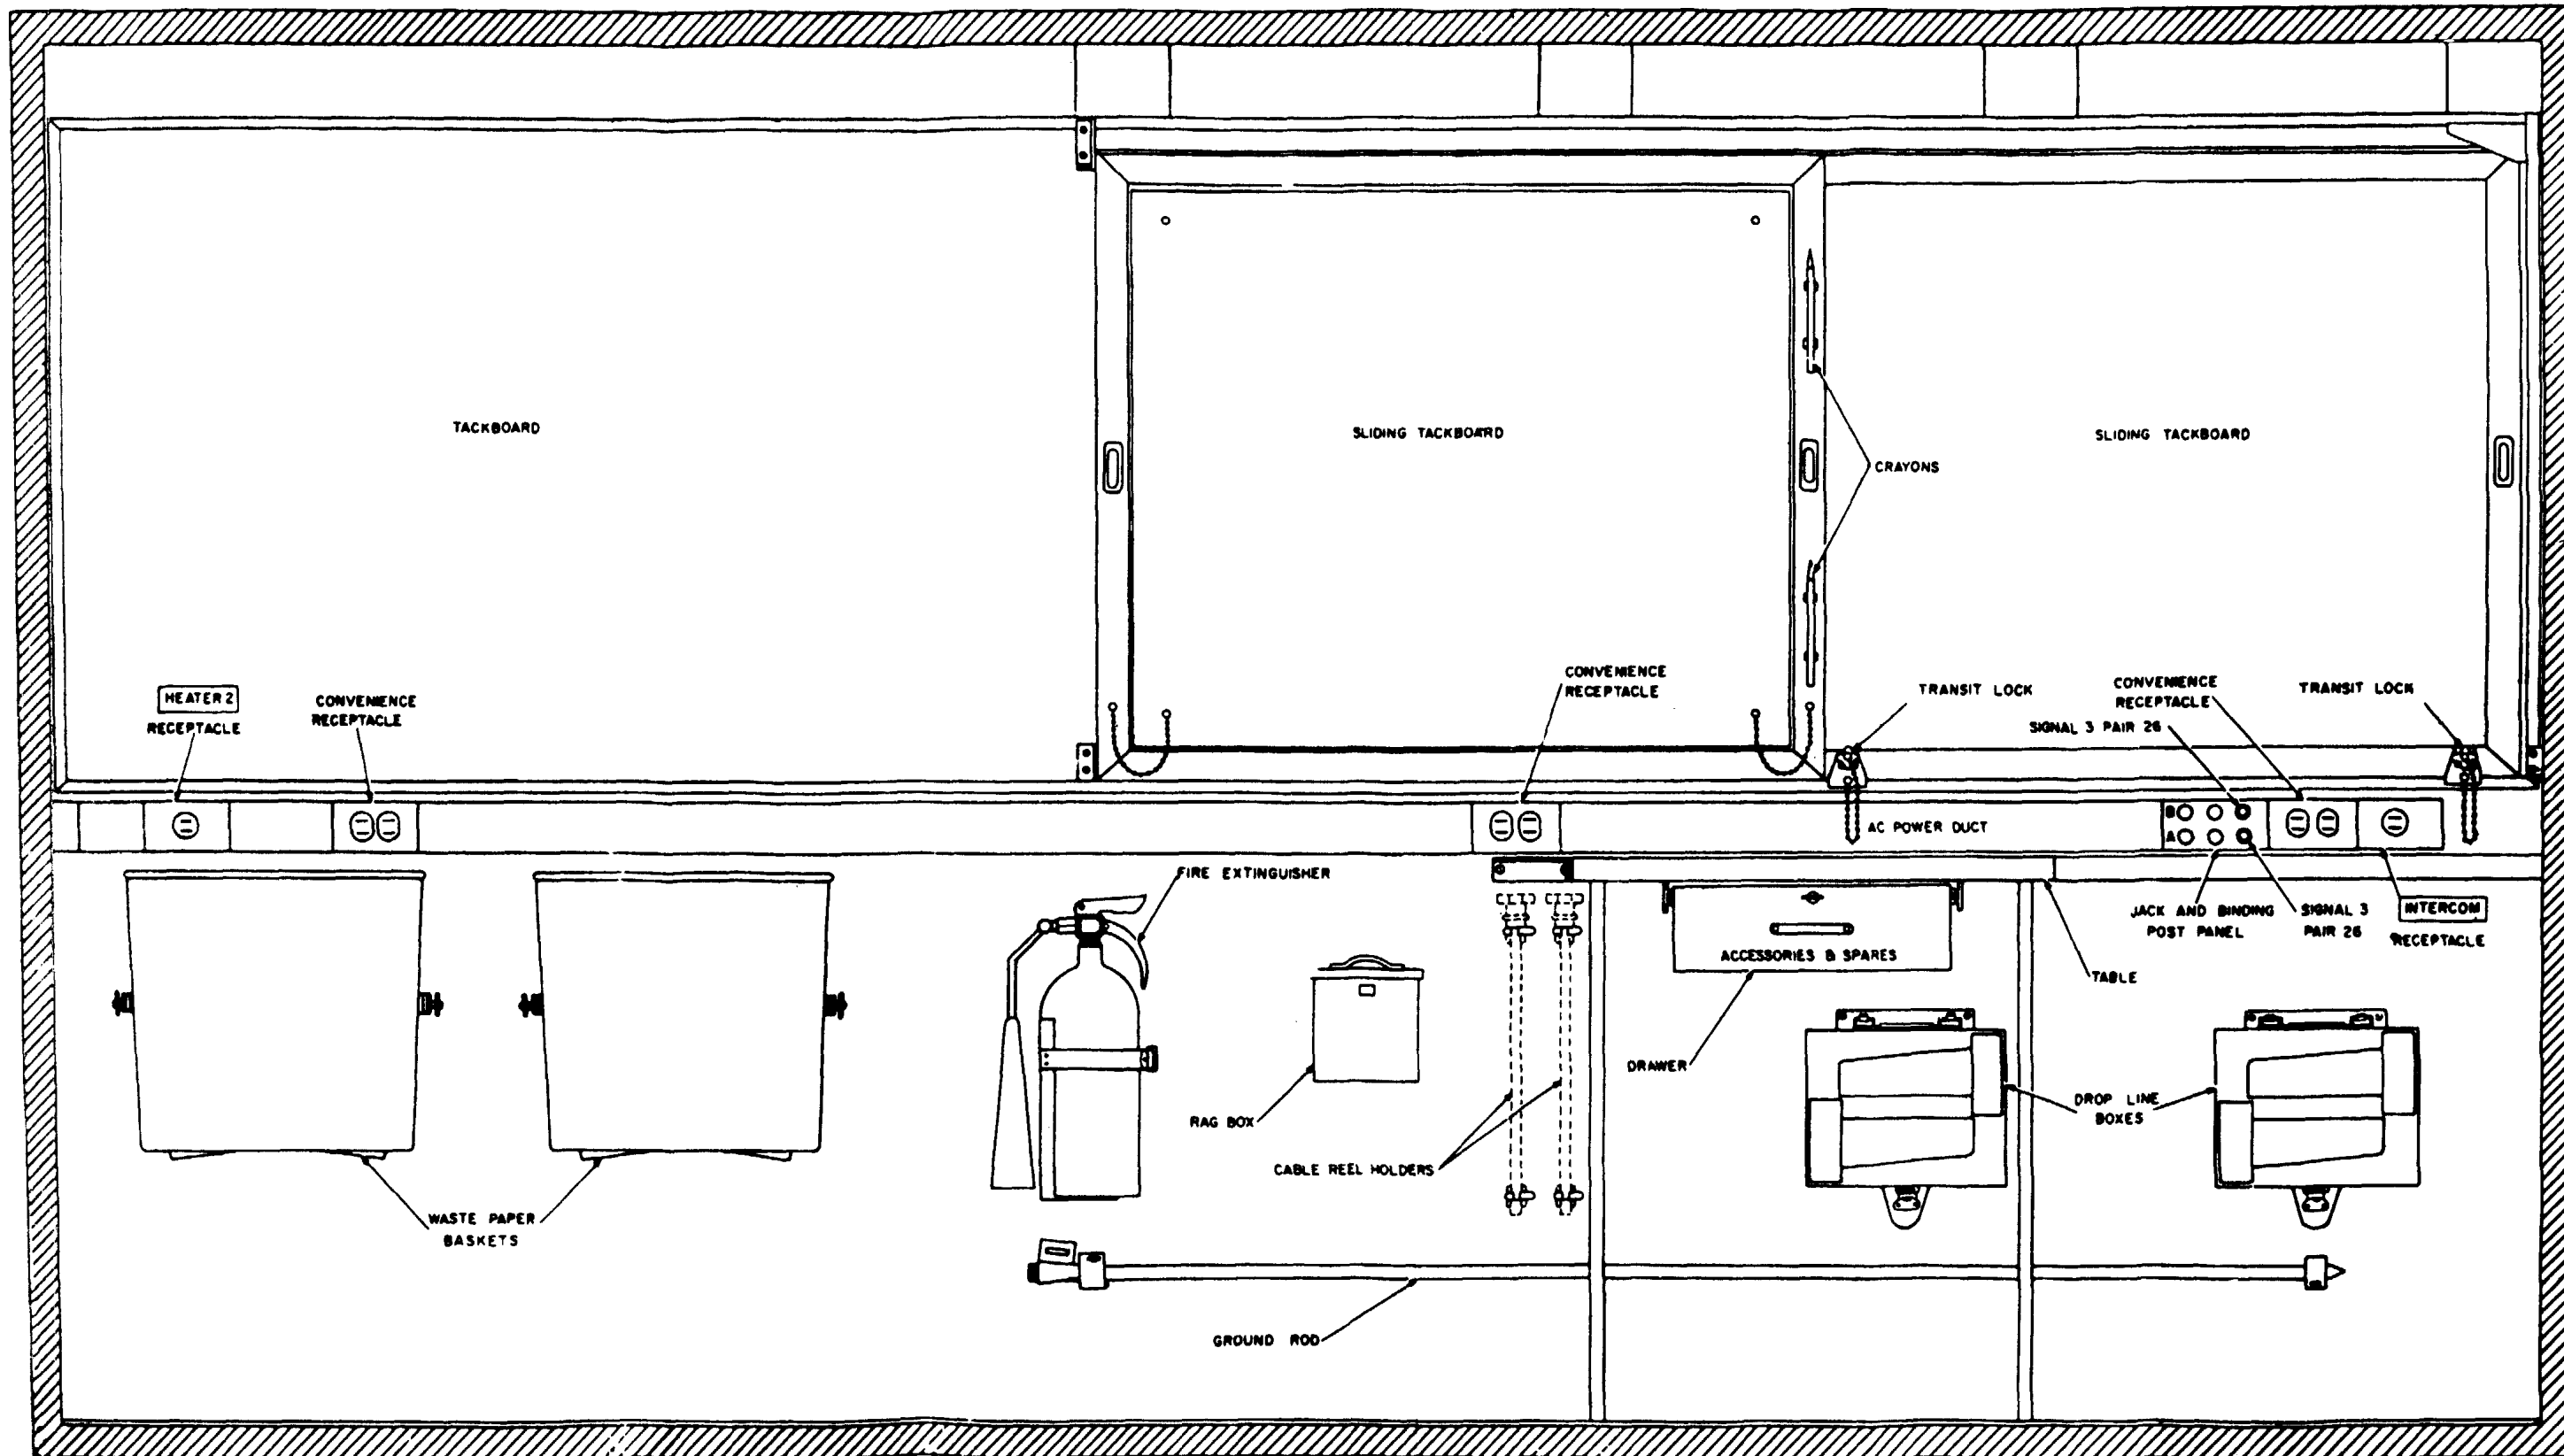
(Superseded) Shelter, elevation at drawing, right wall
